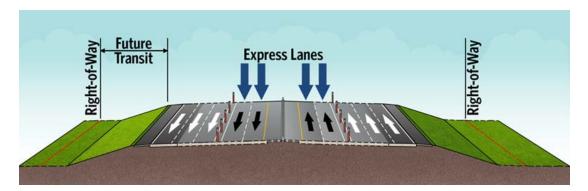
TBX Master Plan Proposed Typical Section (Segment C)
